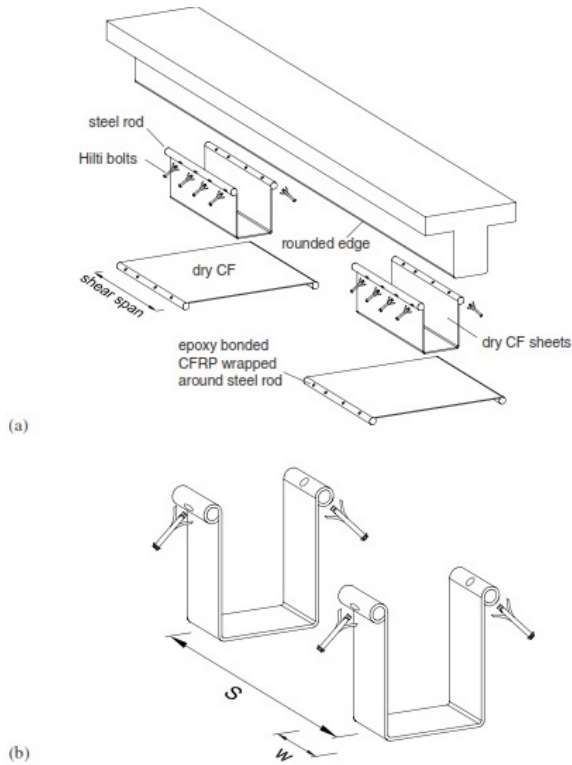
Anchored U-shaped Dry CF Strips a) Continuous Sheet
